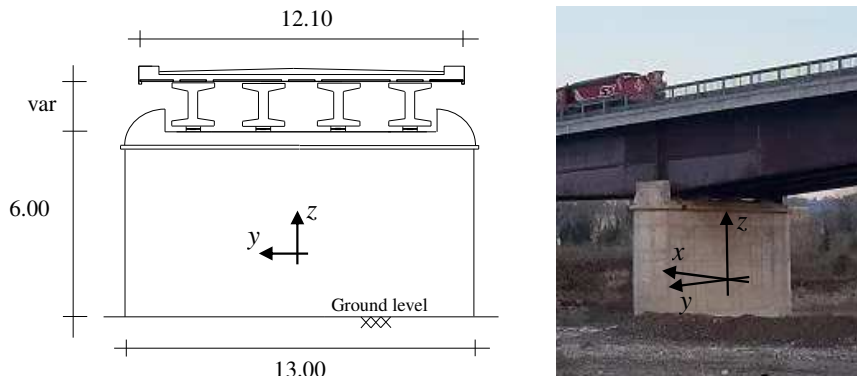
Dimensions of the “Paglia bridge” cross section
